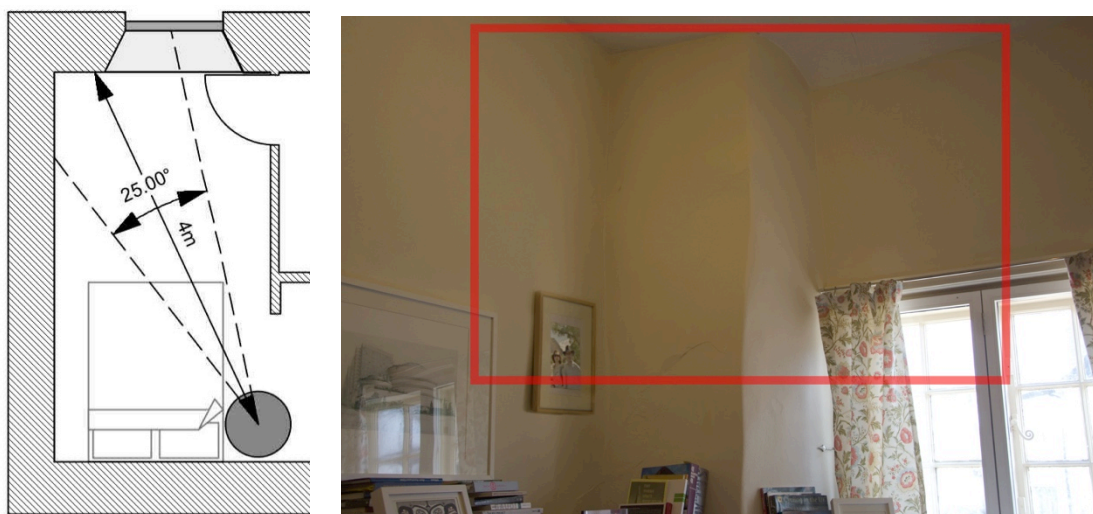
Plan and photo of building 1, study 3. Red box shows limit of thermal camera FOV.
